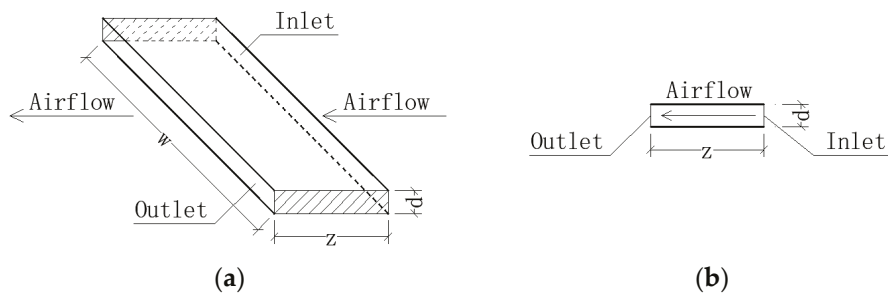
Straight crack between window and frame: (a) three-dimensional view; (b) sectional view.
